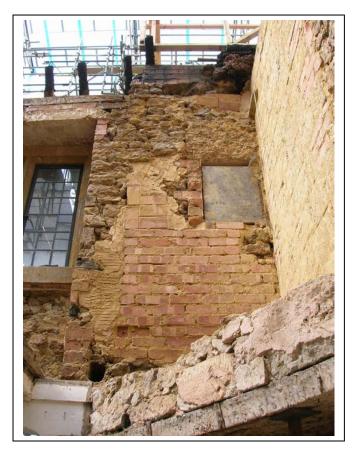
Underside of the four timbers forming bottom element of the base. Plate 12: View north west -first floor with base location to the left.
